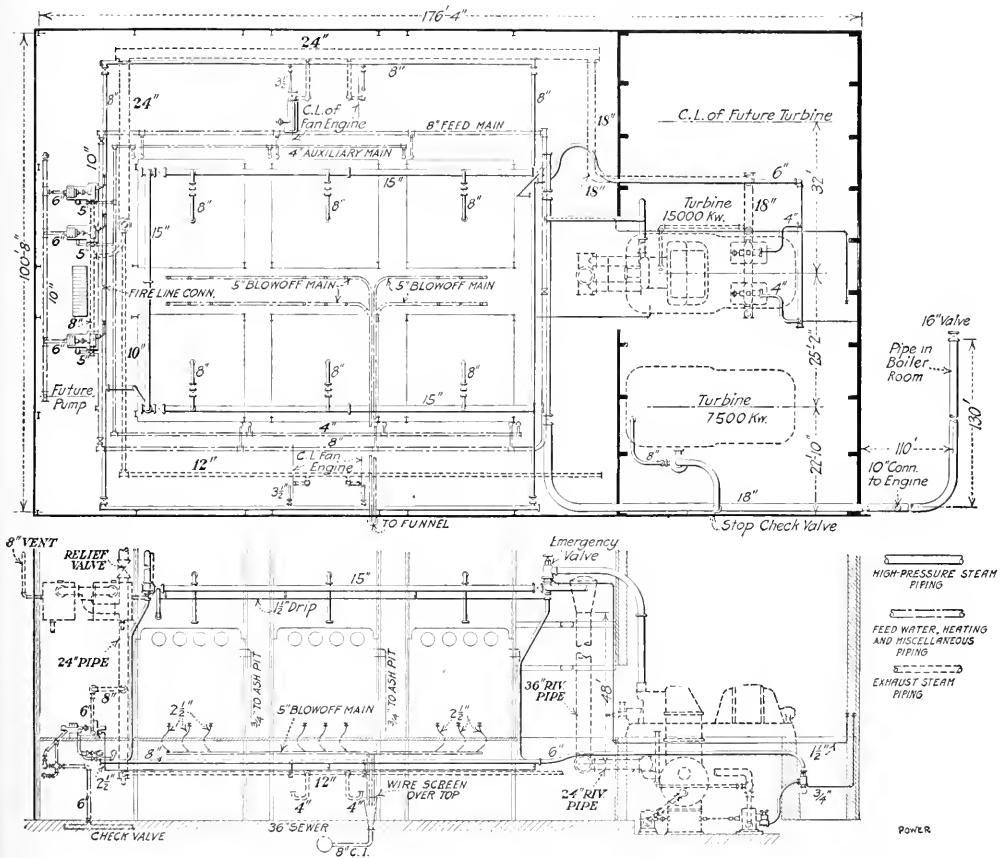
PLAN AND ELEVATION OF THE MOST IMPORTANT PIPING IN THE NEW BOILER HOUSE
